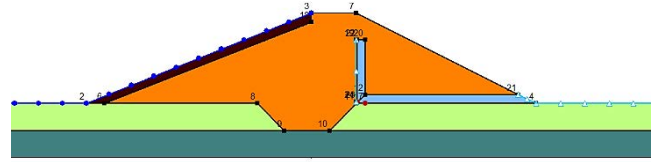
Typical section homogeneous dam: H=10 m, upstream slope 1V:2.5 H.
